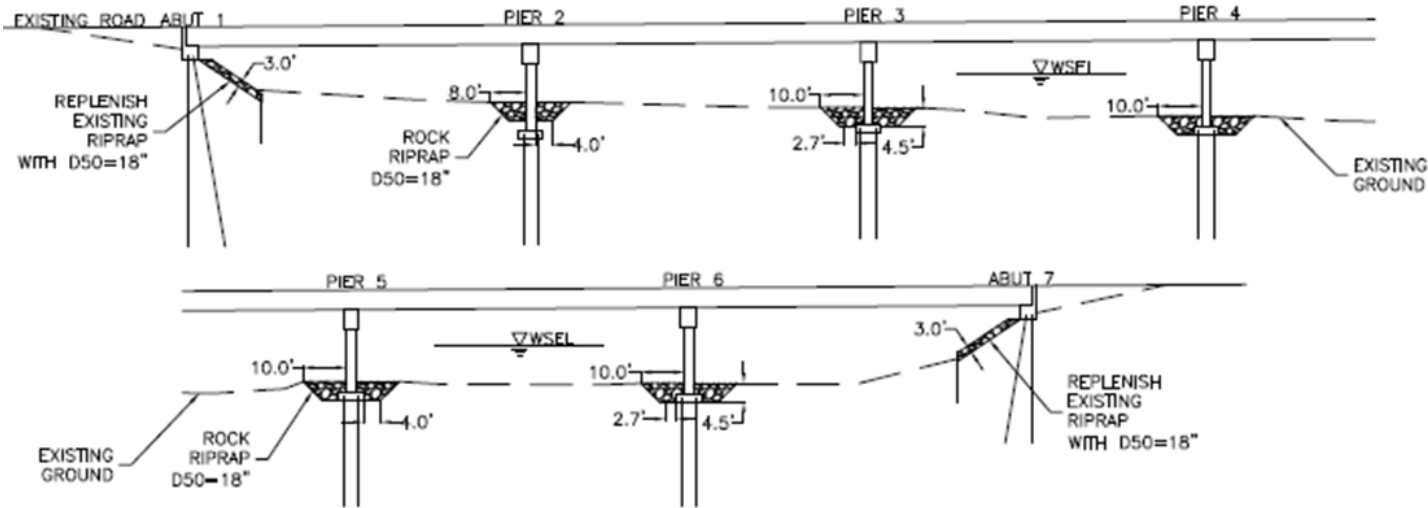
Cross-sectional view of Bridge F-20-BL with recommended hydraulic scour countermeasures
